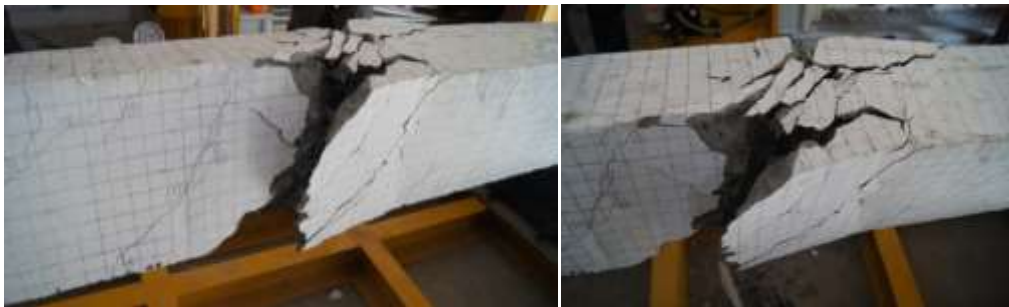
(a, b) Failure of conventional steel reinforced beams due to yielding of longitudinal and transverse steel ($Bp_1m_1F_e$)
